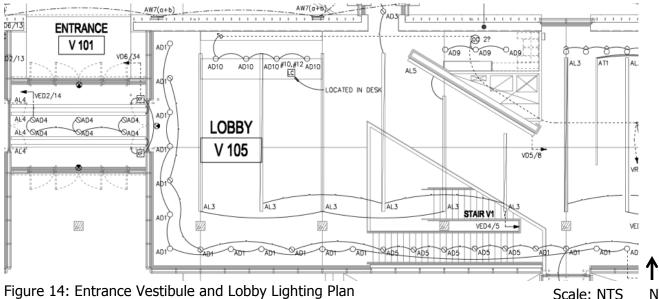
Entrance Vestibule and Lobby Lighting Plan
